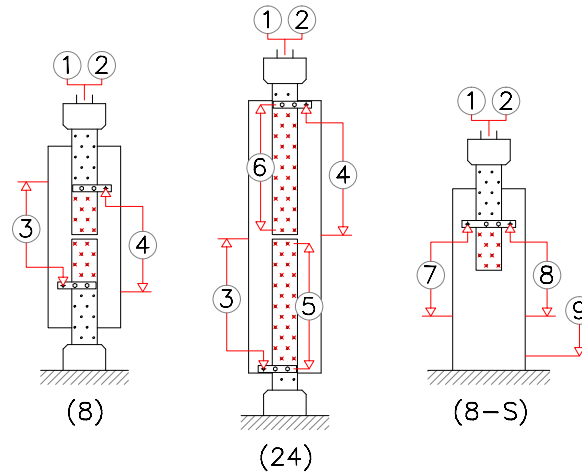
Arrangement of measuring instruments - a) layout 1 (symmetrical - 8 nails) - b) layout 2 (unsymmetrical - 8 nails) - c) layout 3 (symmetrical - 24 nails).
